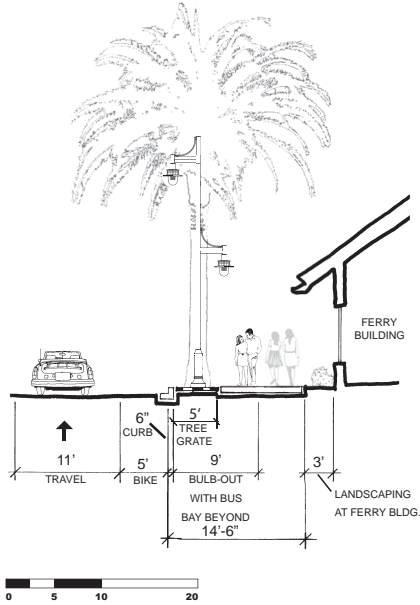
C.53: Section of Mare Island Way at Ferry Building ⑥
